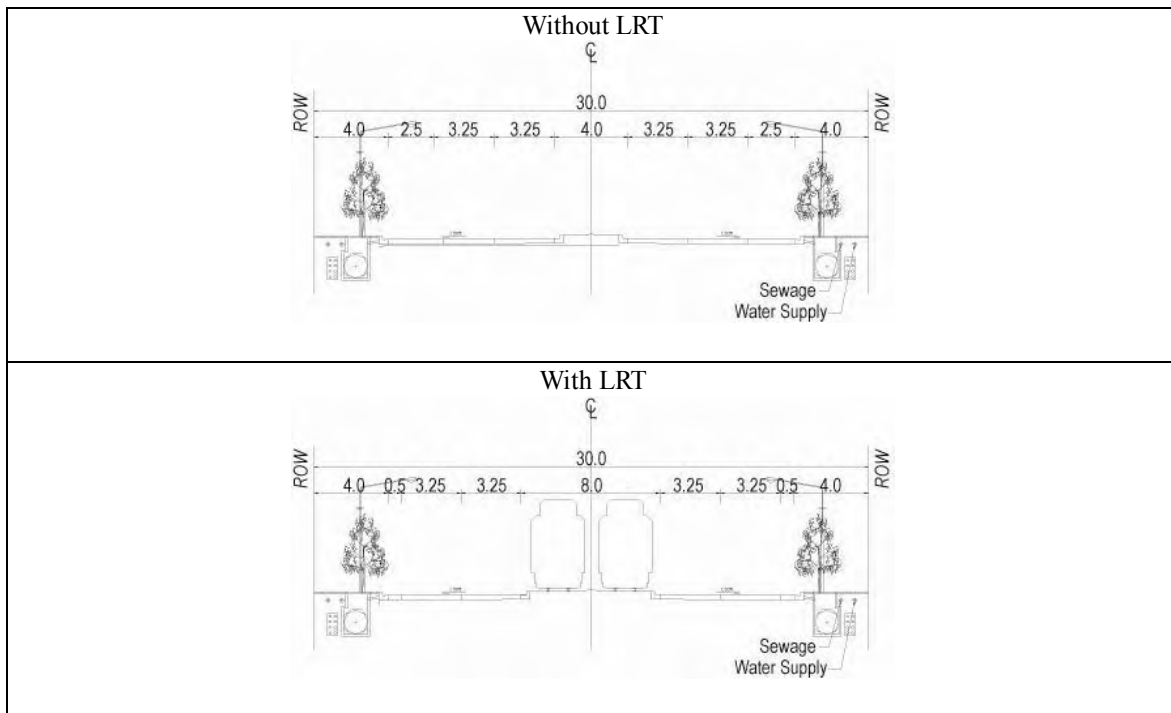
Typical Cross-section of a Secondary Road (D: ROW = 30m)
